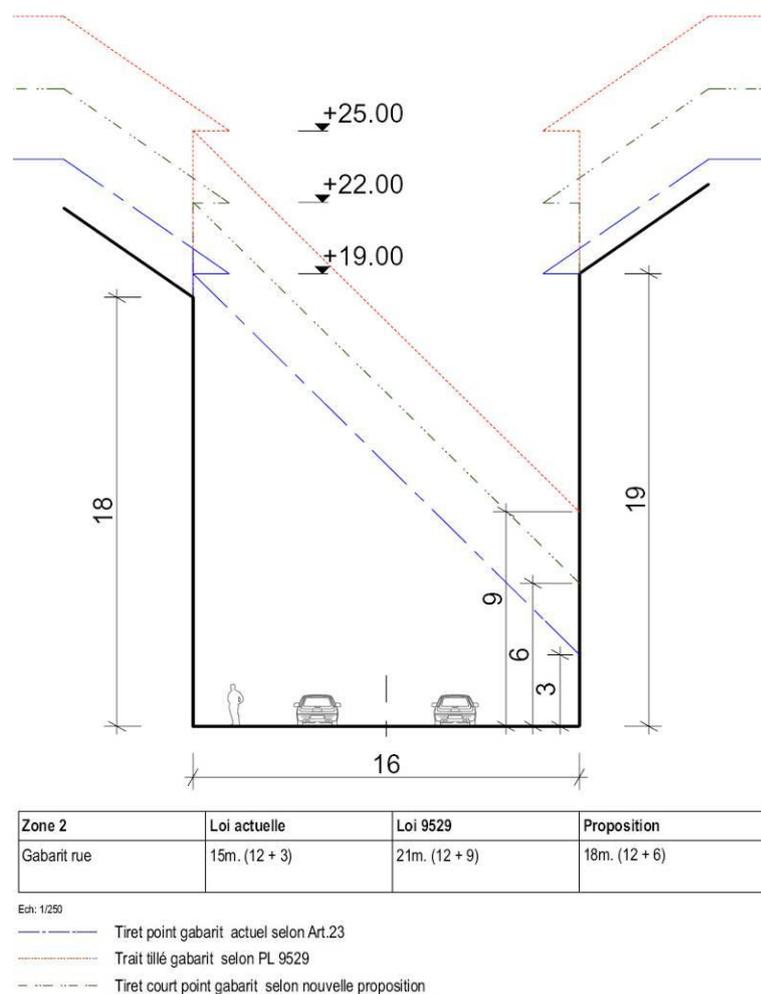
Les Pâquis district. The legal possibility to heighten buildings is related to the street width: the maximum authorized building outline cannot exceed this width adding up to 6 metres, within the limit of 30 metres in total. Dashed line: building outline according to PL 9529 (top). Dash-point line: building outline according to new proposal (middle). Long dash-short dash line: current building outline according to Art. 23 (bottom).
